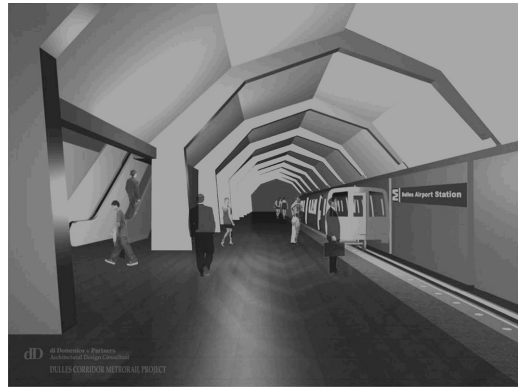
Station tunnel rendering (by diDo menico + Partners, Architectural Design Consultant).
